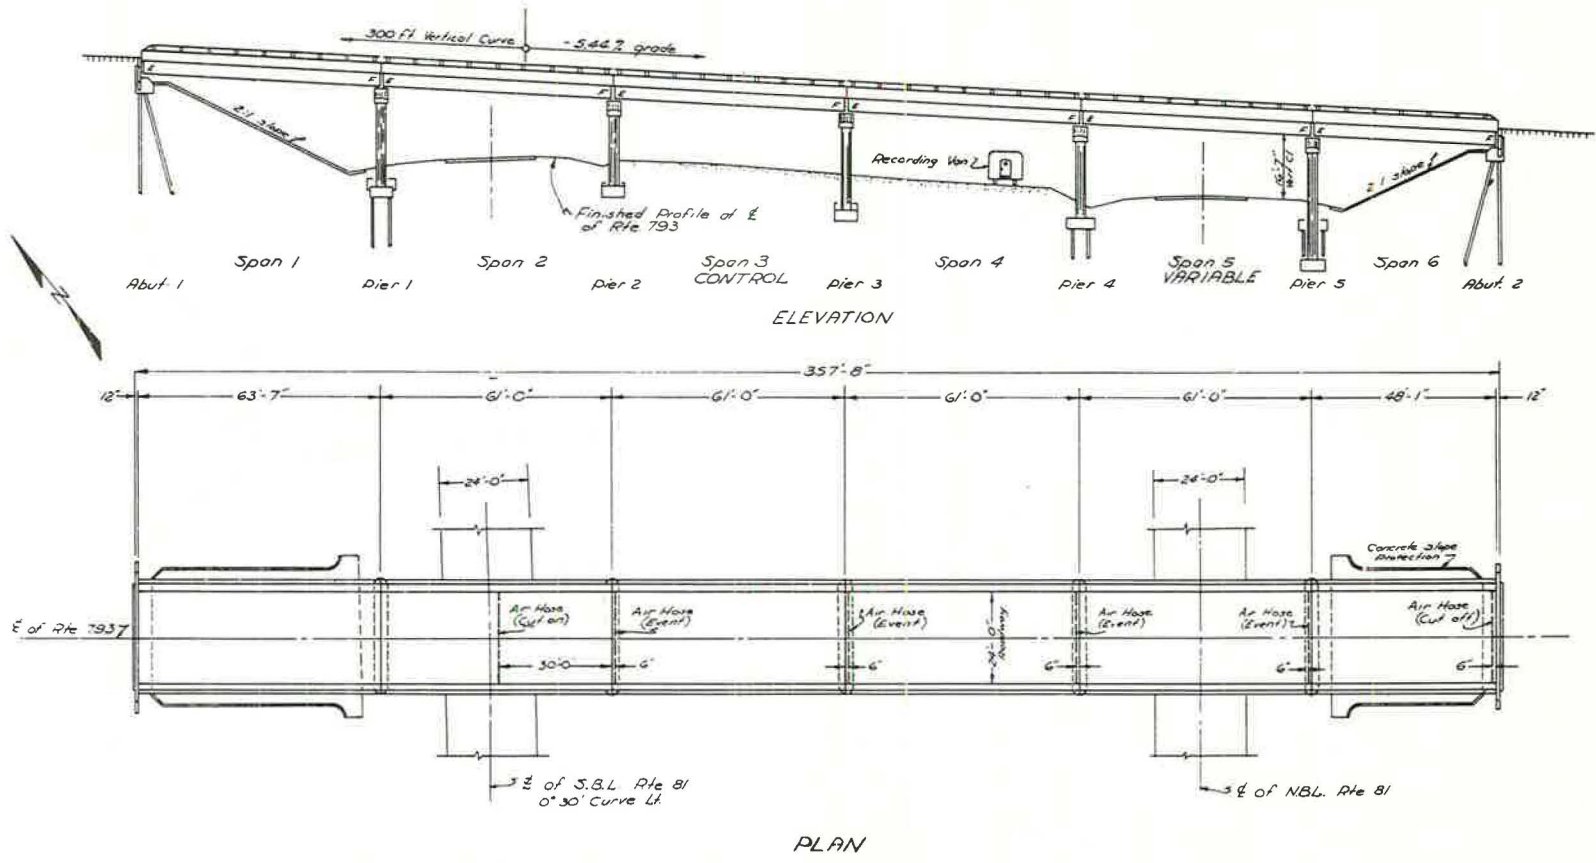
Plan and elevation of test structure indicating control and variable spans.
